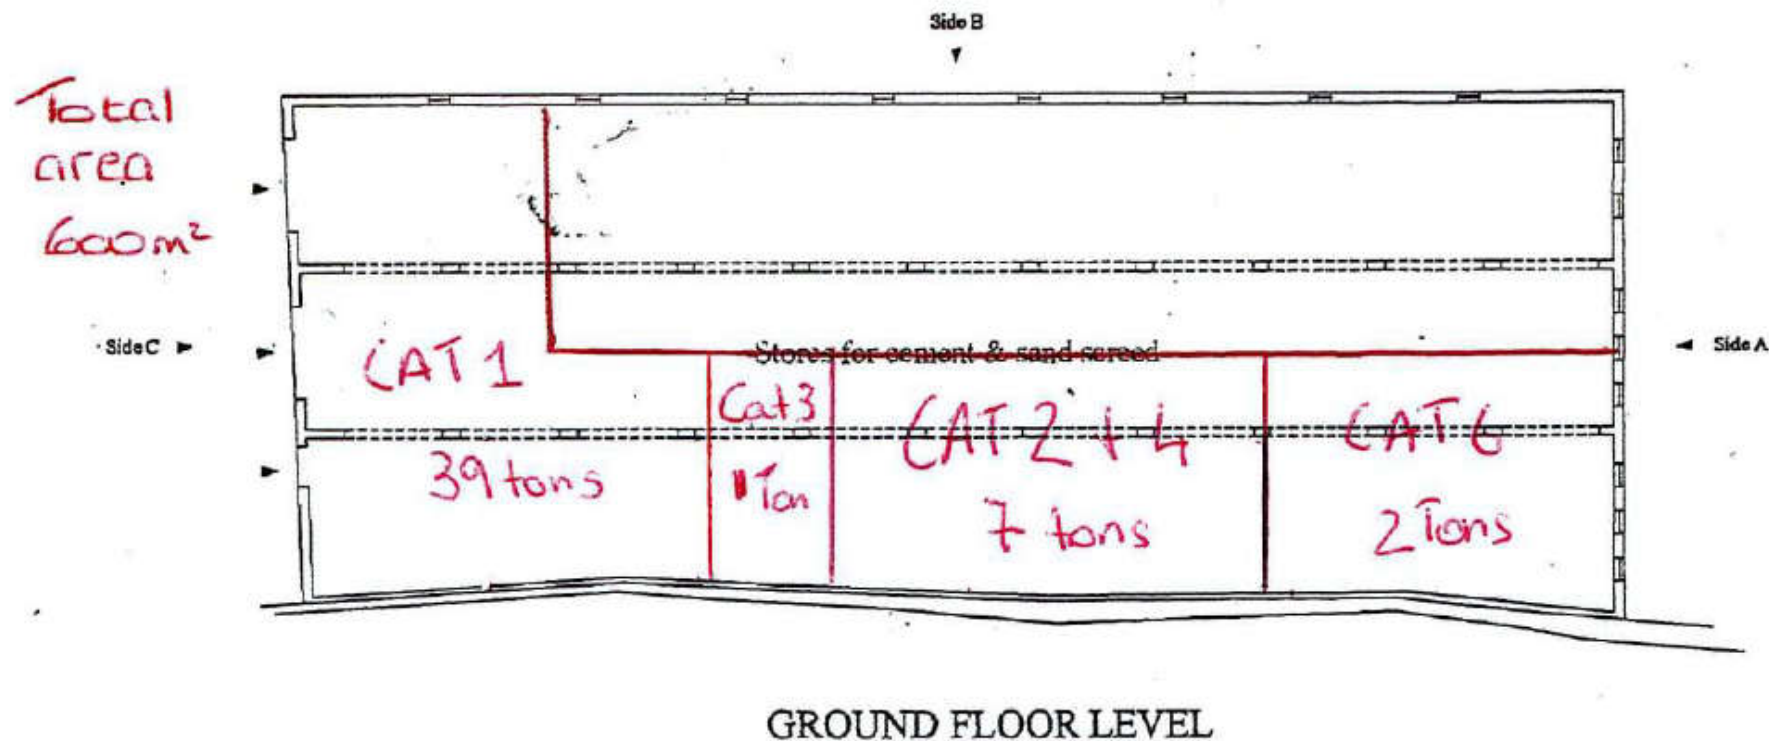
Site Layout plan showing where the waste is to be stored for the carrying out of the operations specified in condition 1.1.1. The extent of the site boundary is indicative and should not be used for interpretation purposes.
